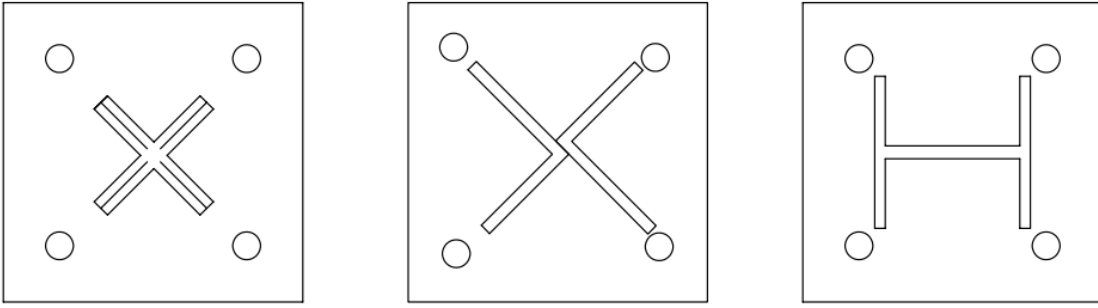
AutoCAD Sketches of the three specimens at the lab to be tested.
